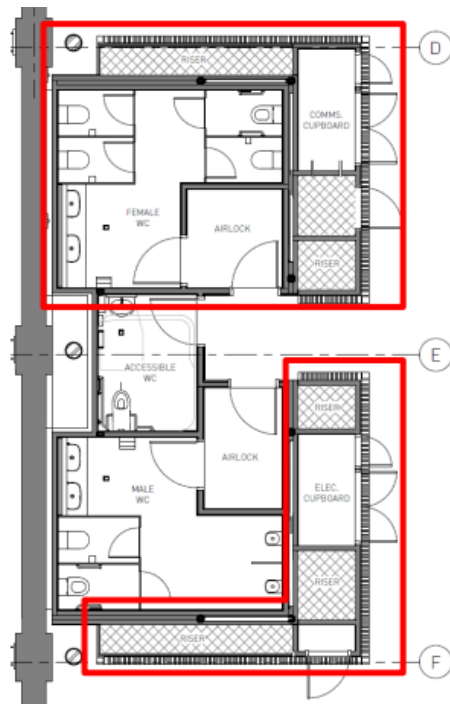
| Proposed typical service pod details – modified elements indicated in red (Source: Applicant)
